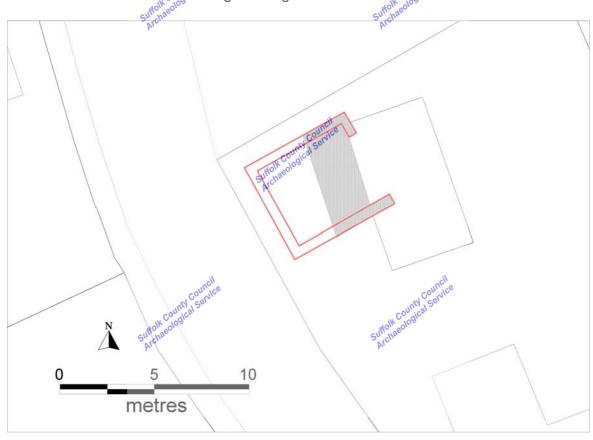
Plan of the foundation trenches (red) and the pipe trench (shaded)
